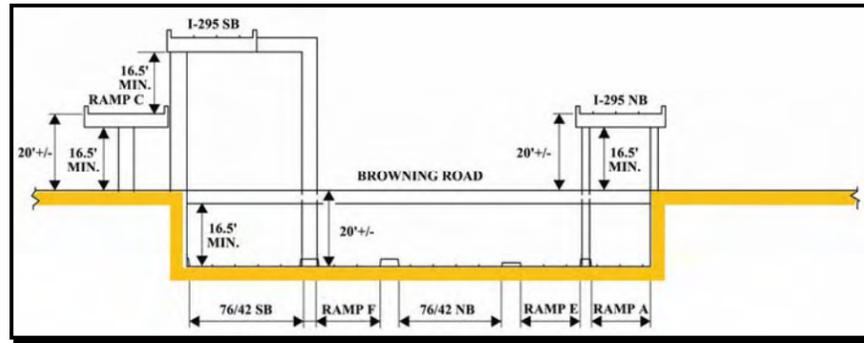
Section A-A at Browning Road (Alternative F)
